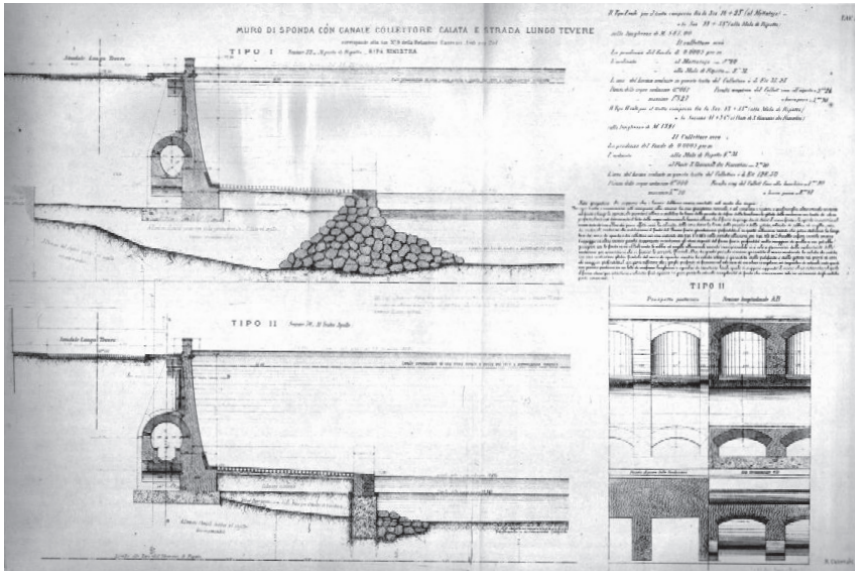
, Embankment wall drawings by Raffaele Canevari, 1871
